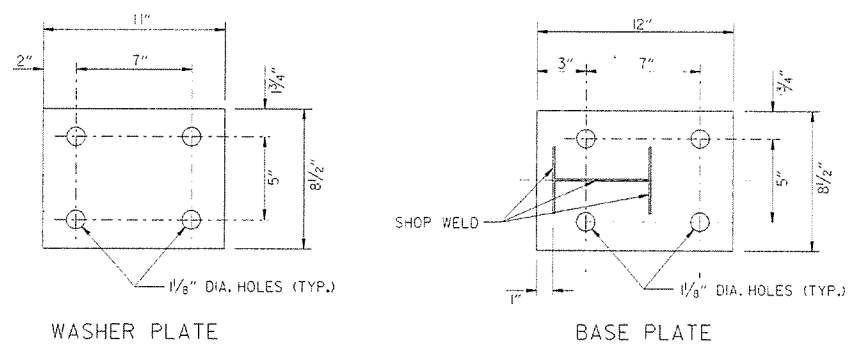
DETAILS OF STEEL LINE POST CONNECTIONS (W-BEAM)
